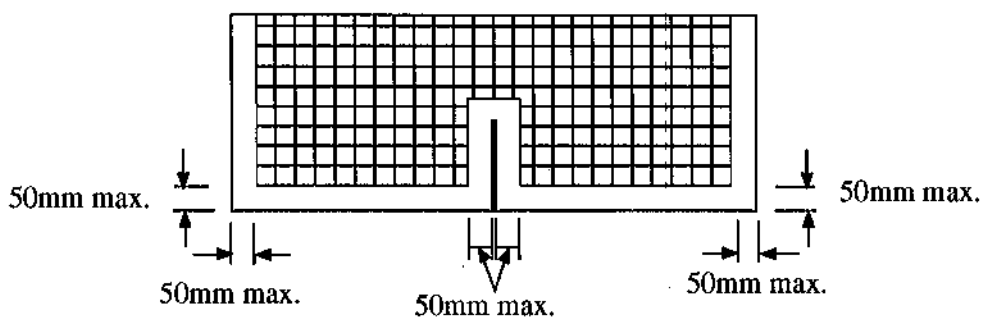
Metal Mesh layout for Test Specimens Coated with Type 1 pfp Material
